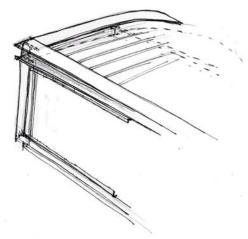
Fixing of IBR sheeting to main steel structure. View from outside __Scale : not to scale (Author, 2008)
